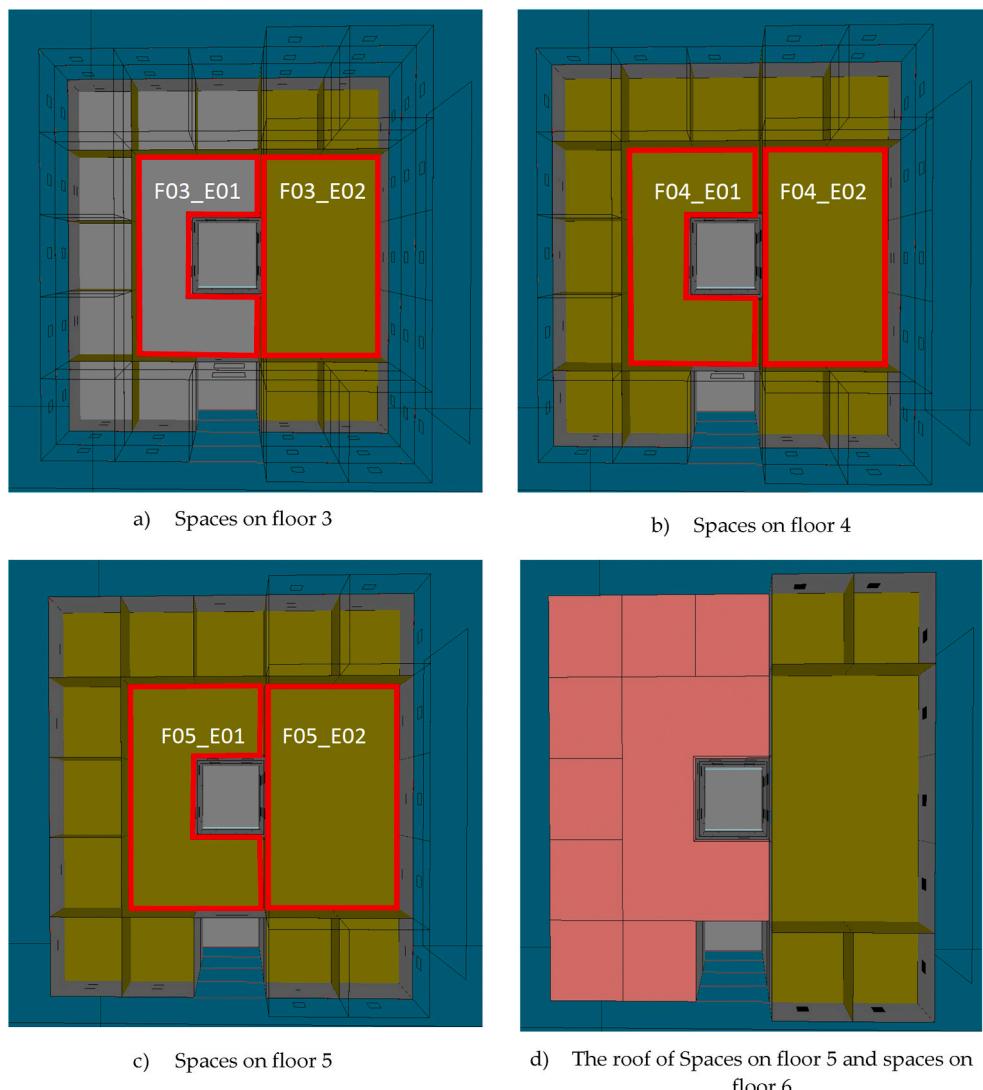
Spaces limiting with the courtyard. It can be seen that the floor of space E01 of the third floor is in contact with the exterior air. (grey color denotes element in contact with the exterior and green color denotes element in contact with the interior element).
